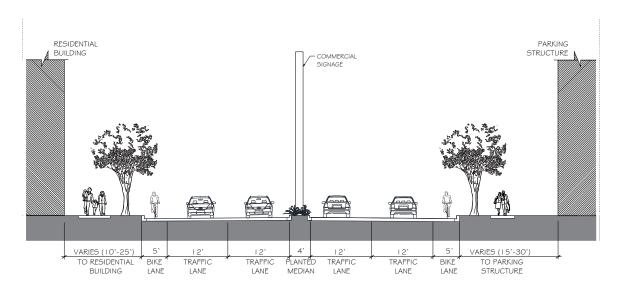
Ontario Center Parkway (East of Via Asti) Public Streetscape Section and Plan
